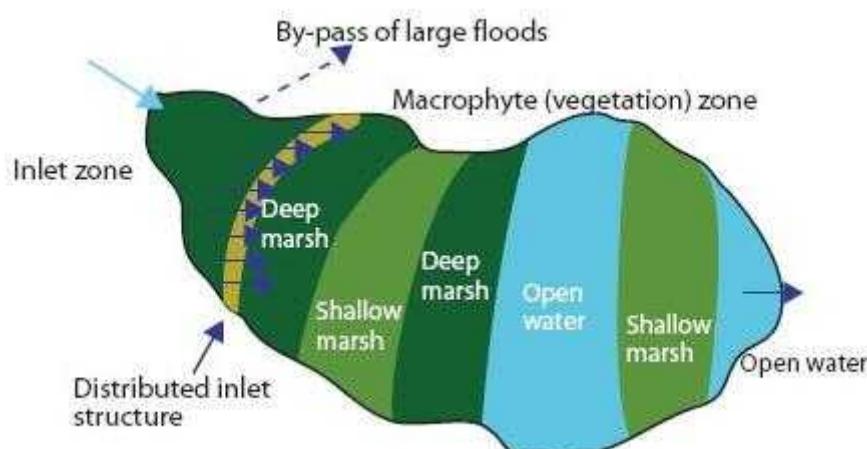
Constructed wetland elements plan view (Melbourne Water, 2005)
